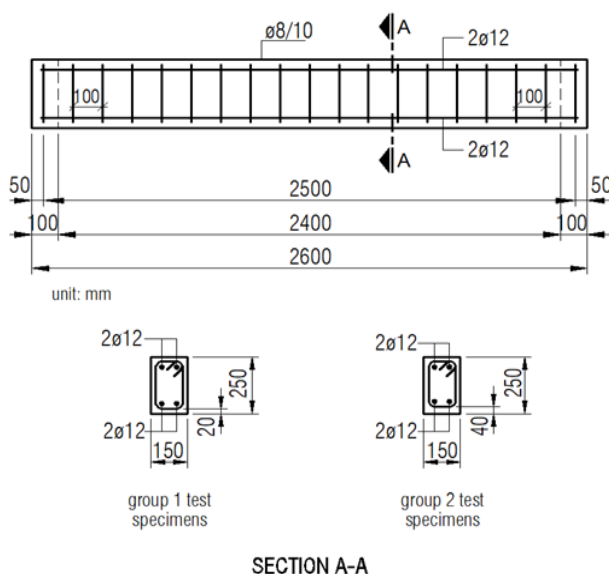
Geometry, steel reinforcement of beams tested in flexure
